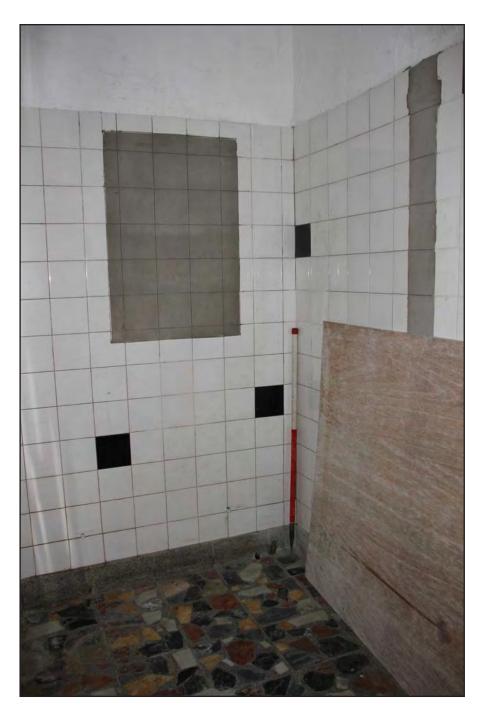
The Whitehouse Hotel ground floor Toilet, from the west. Scale 1.0m.
